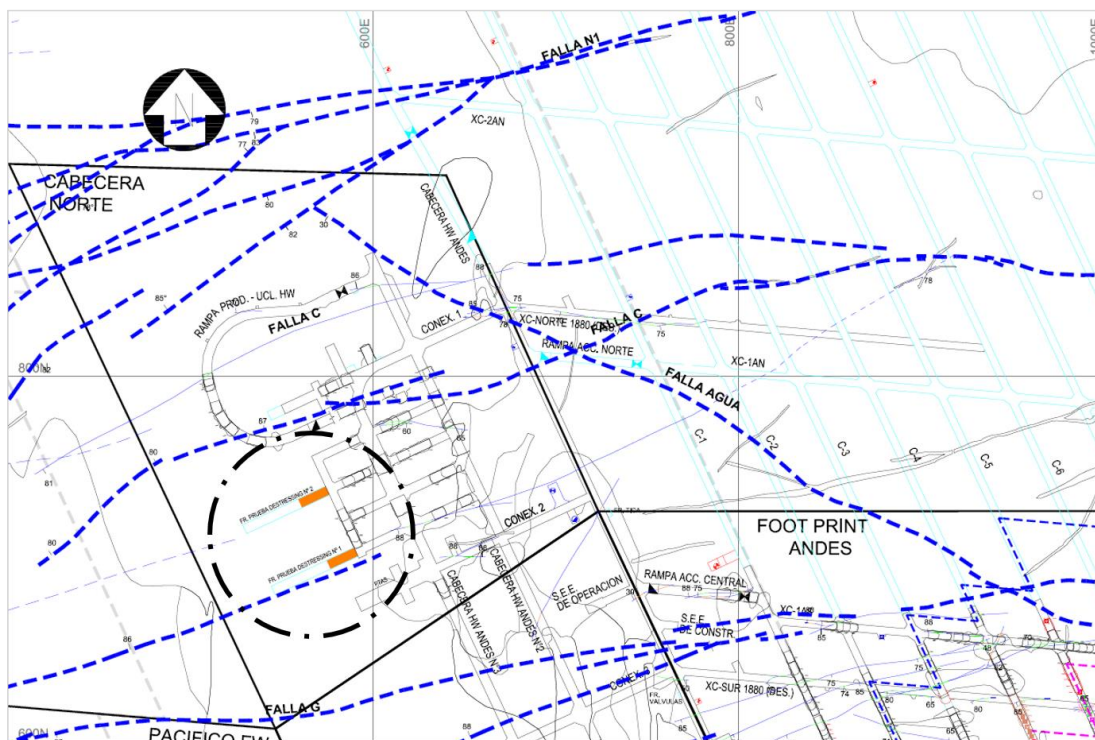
Plan view of structural interpretations surrounding the location of experimental tunnels.
